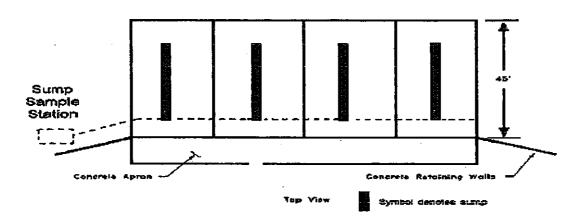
RH-TRU Retrievable Concrete Storage Facility, Building 7855.
